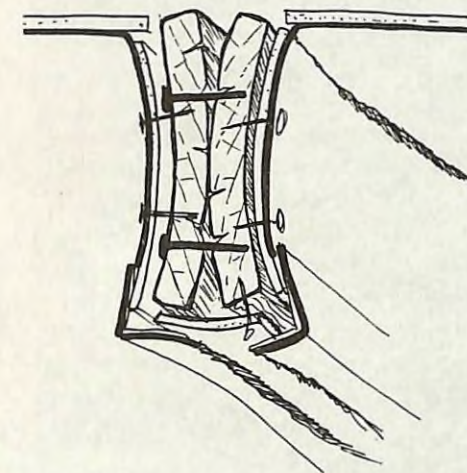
When drywall is nailed to a laminated wood drop beam that has not been nailed properly, as the wood warps and cups when it dries, stresses will rip apart the drywall.
